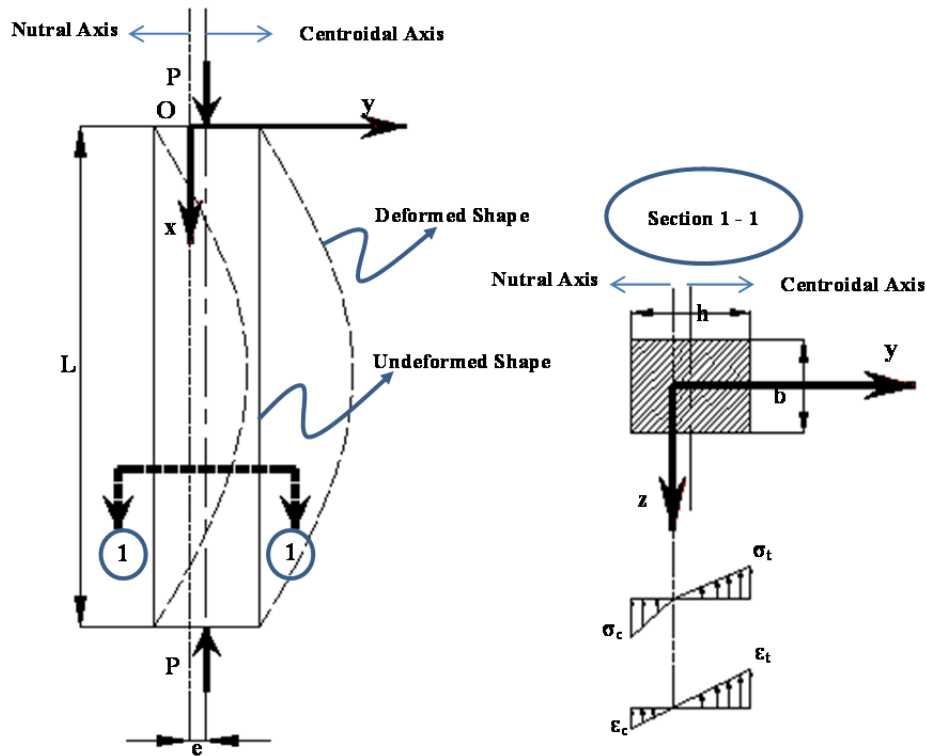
Geometrical properties of Considered Column and Cross Section 1 – 1 of Column With Stress and Strain Distribution
